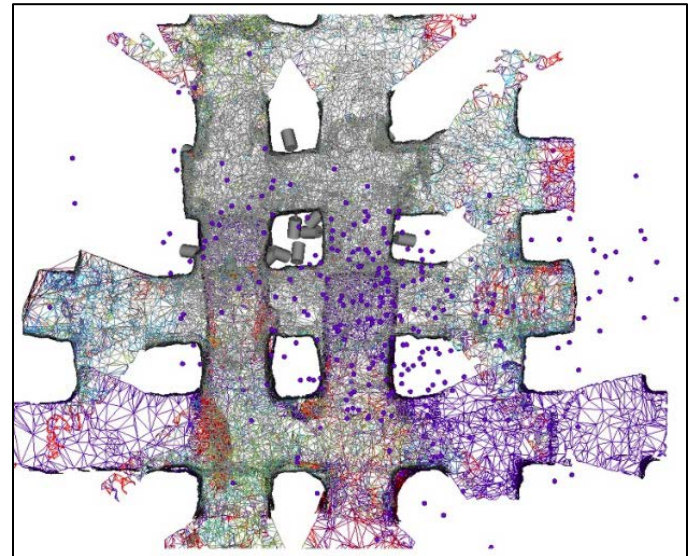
Rib spalling near the southwest corner of the study pillar at Site A. Colored areas indicate fallen material.
